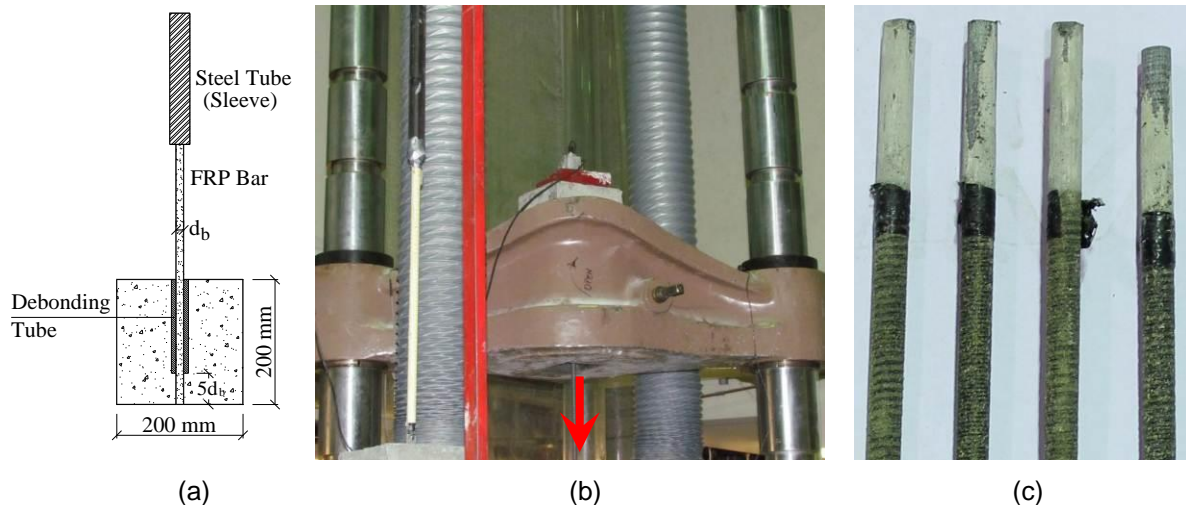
Pullout test: (a) Geometry of the specimens; (b) Test setup; (c) Mode of failure
